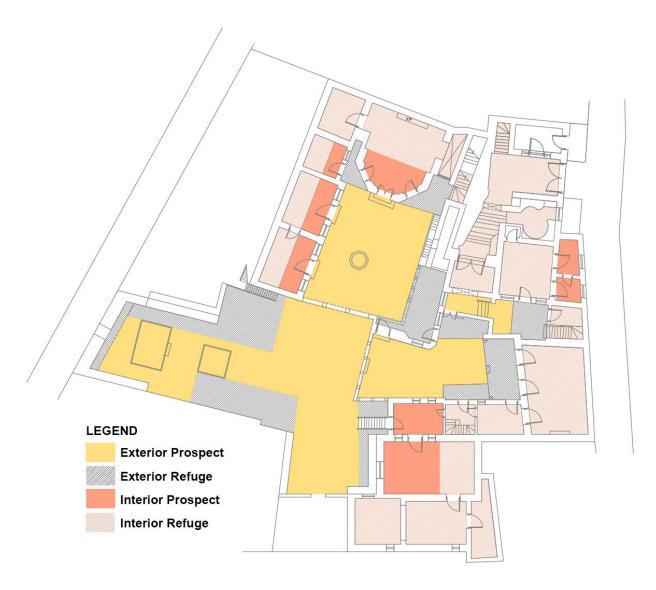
Ground Floor Plan; Prospect and Refuge
